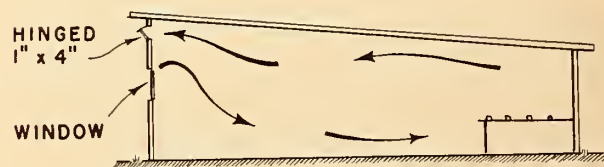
Gravity ventilation of a fully insulated laying house.
